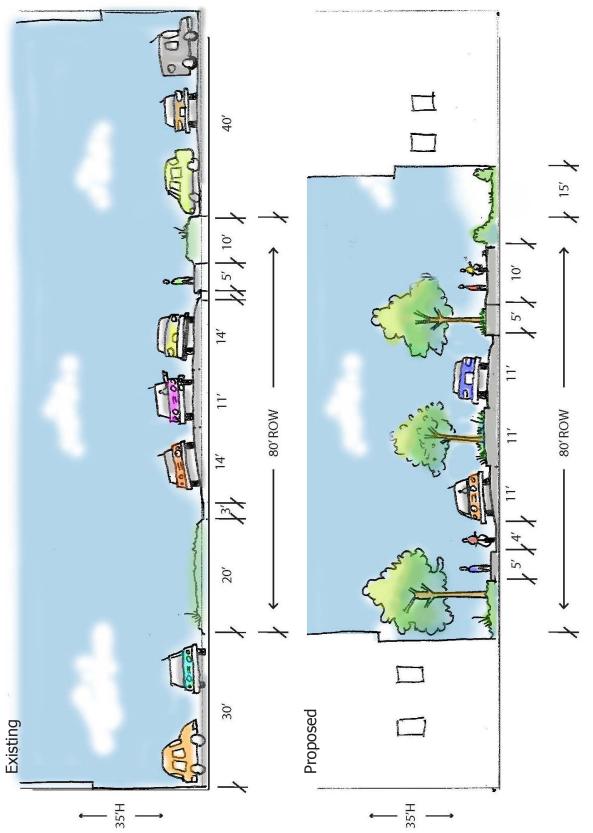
Figure D: Existing and Proposed street cross section west of Forest Road/Route 28 intersection.
